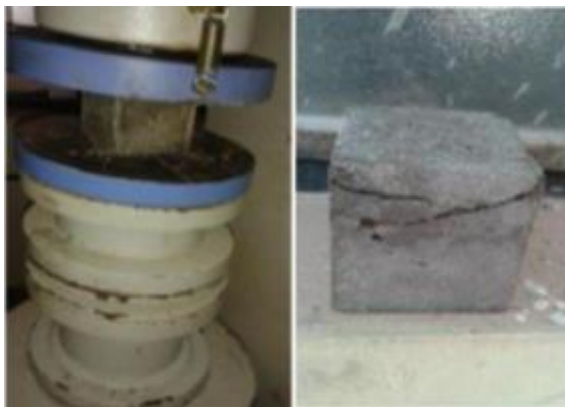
Picture of sample testing (a) Specimen before testing (b) Specimen after testing
